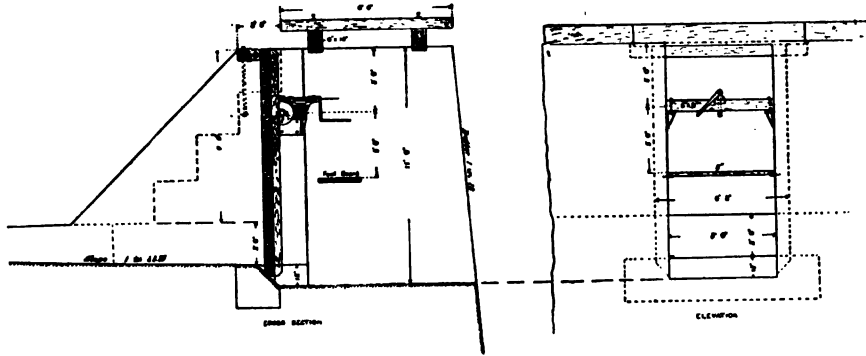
Folsom canal. Cross section and elevation of sand-gates.
